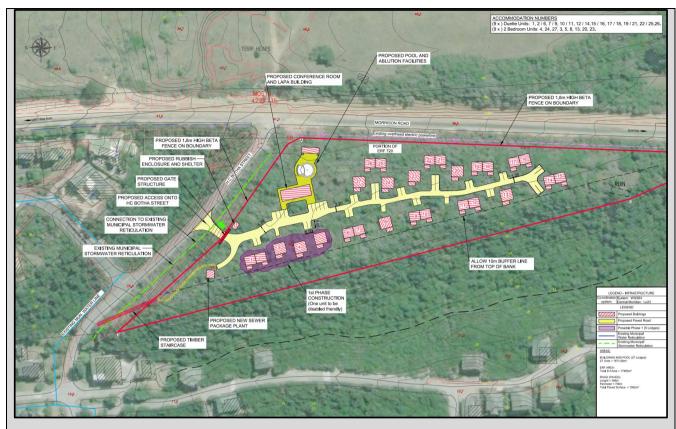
Alternative 2 site development plan without specialist mitigation measures reflected, plus on-site sewage package plant.
